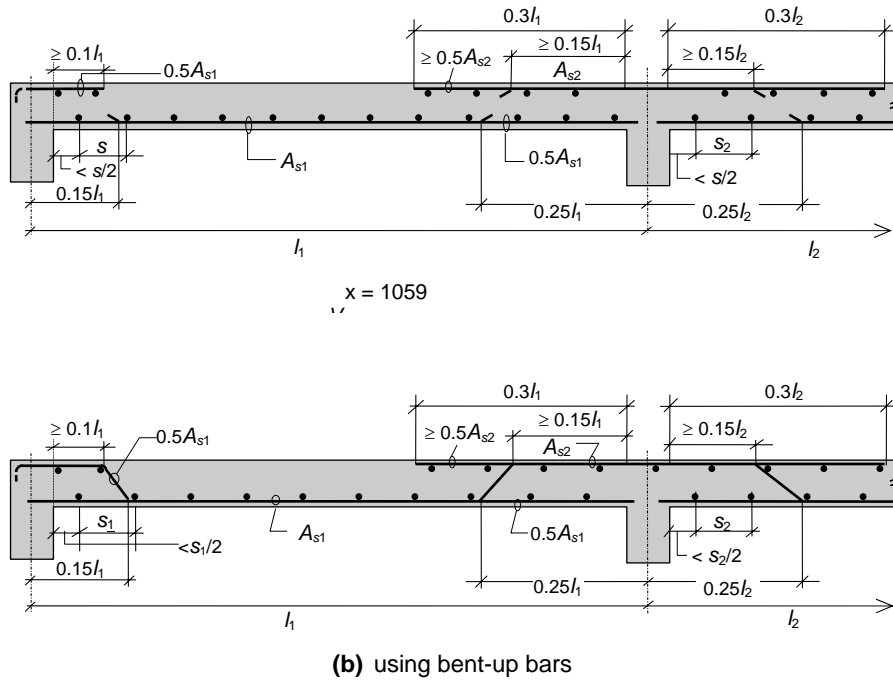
Arrangement of main reinforcement in one-way continuous slabs [Ref. 5.6]
